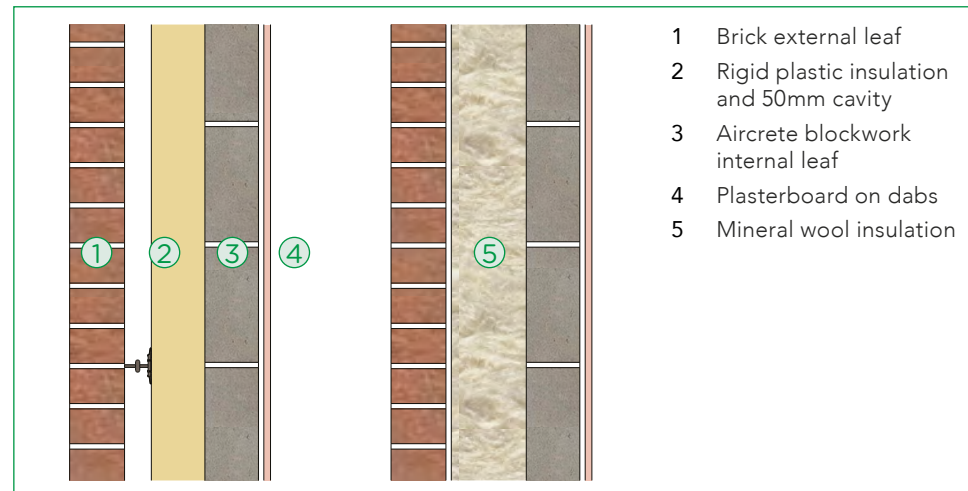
2019 typical masonry external walls, partial-fill rigid insulation shown on left and full-fill insulation on right
